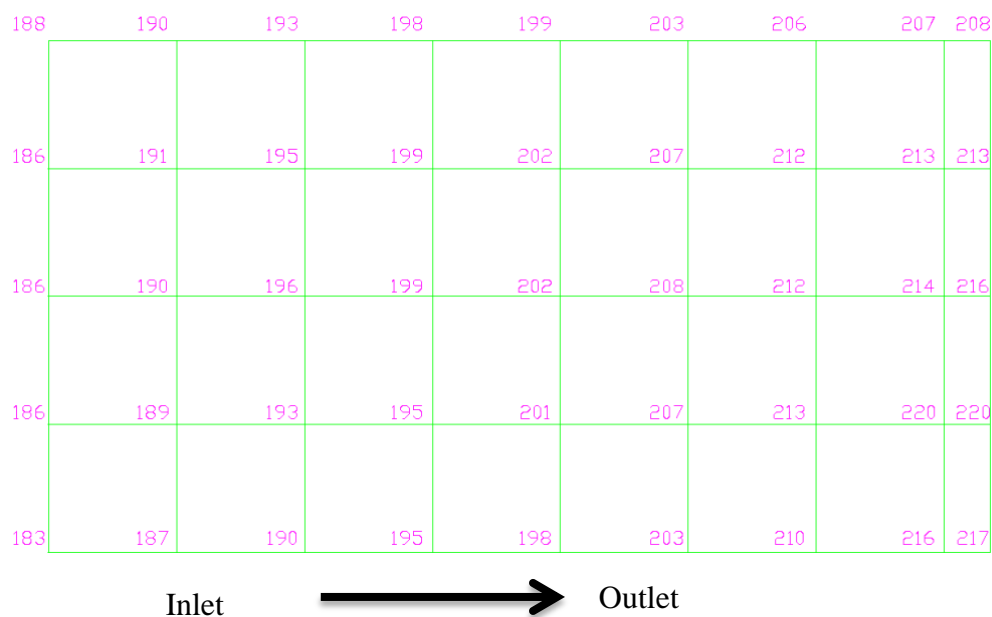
Initial elevation above datum (in mm) of the system divided in a grid 1 m x 1 m
